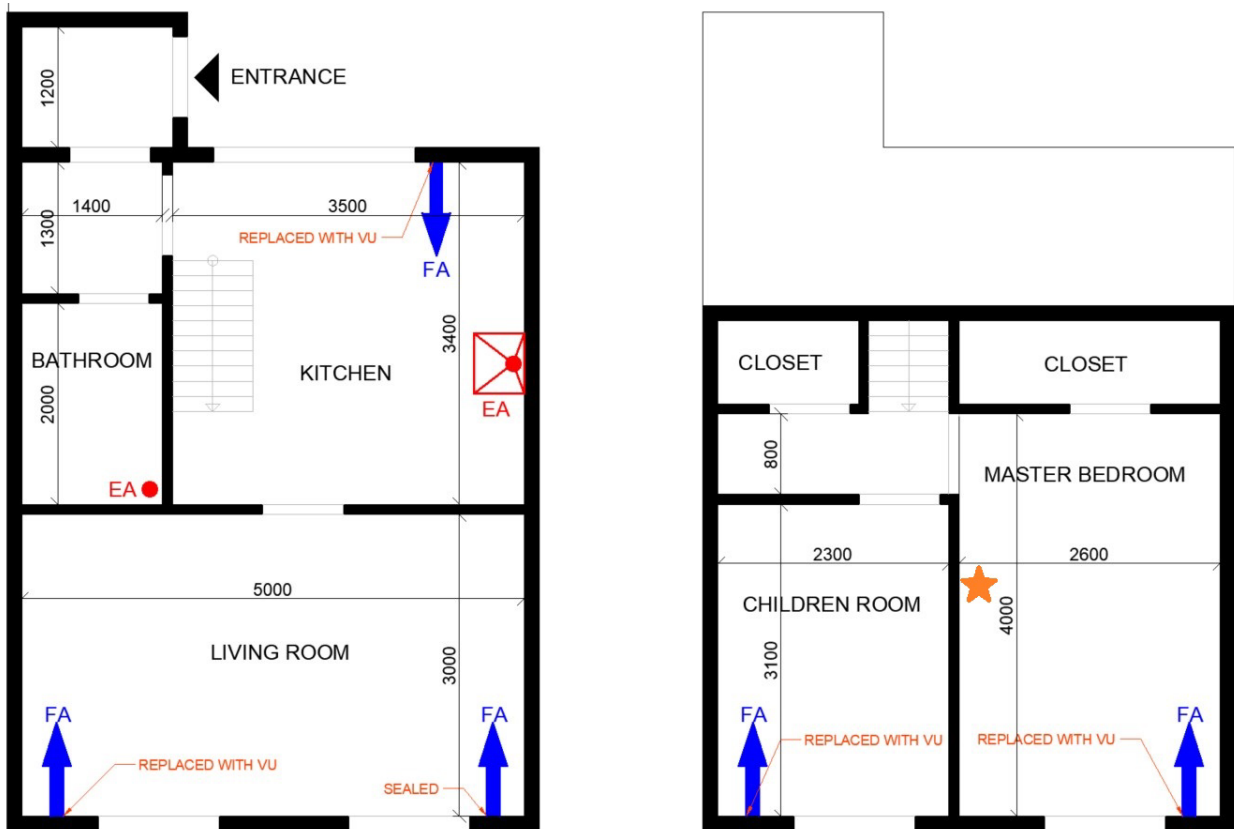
Building 3 - Floor plans. The star indicates placement of the IAQ meter.
